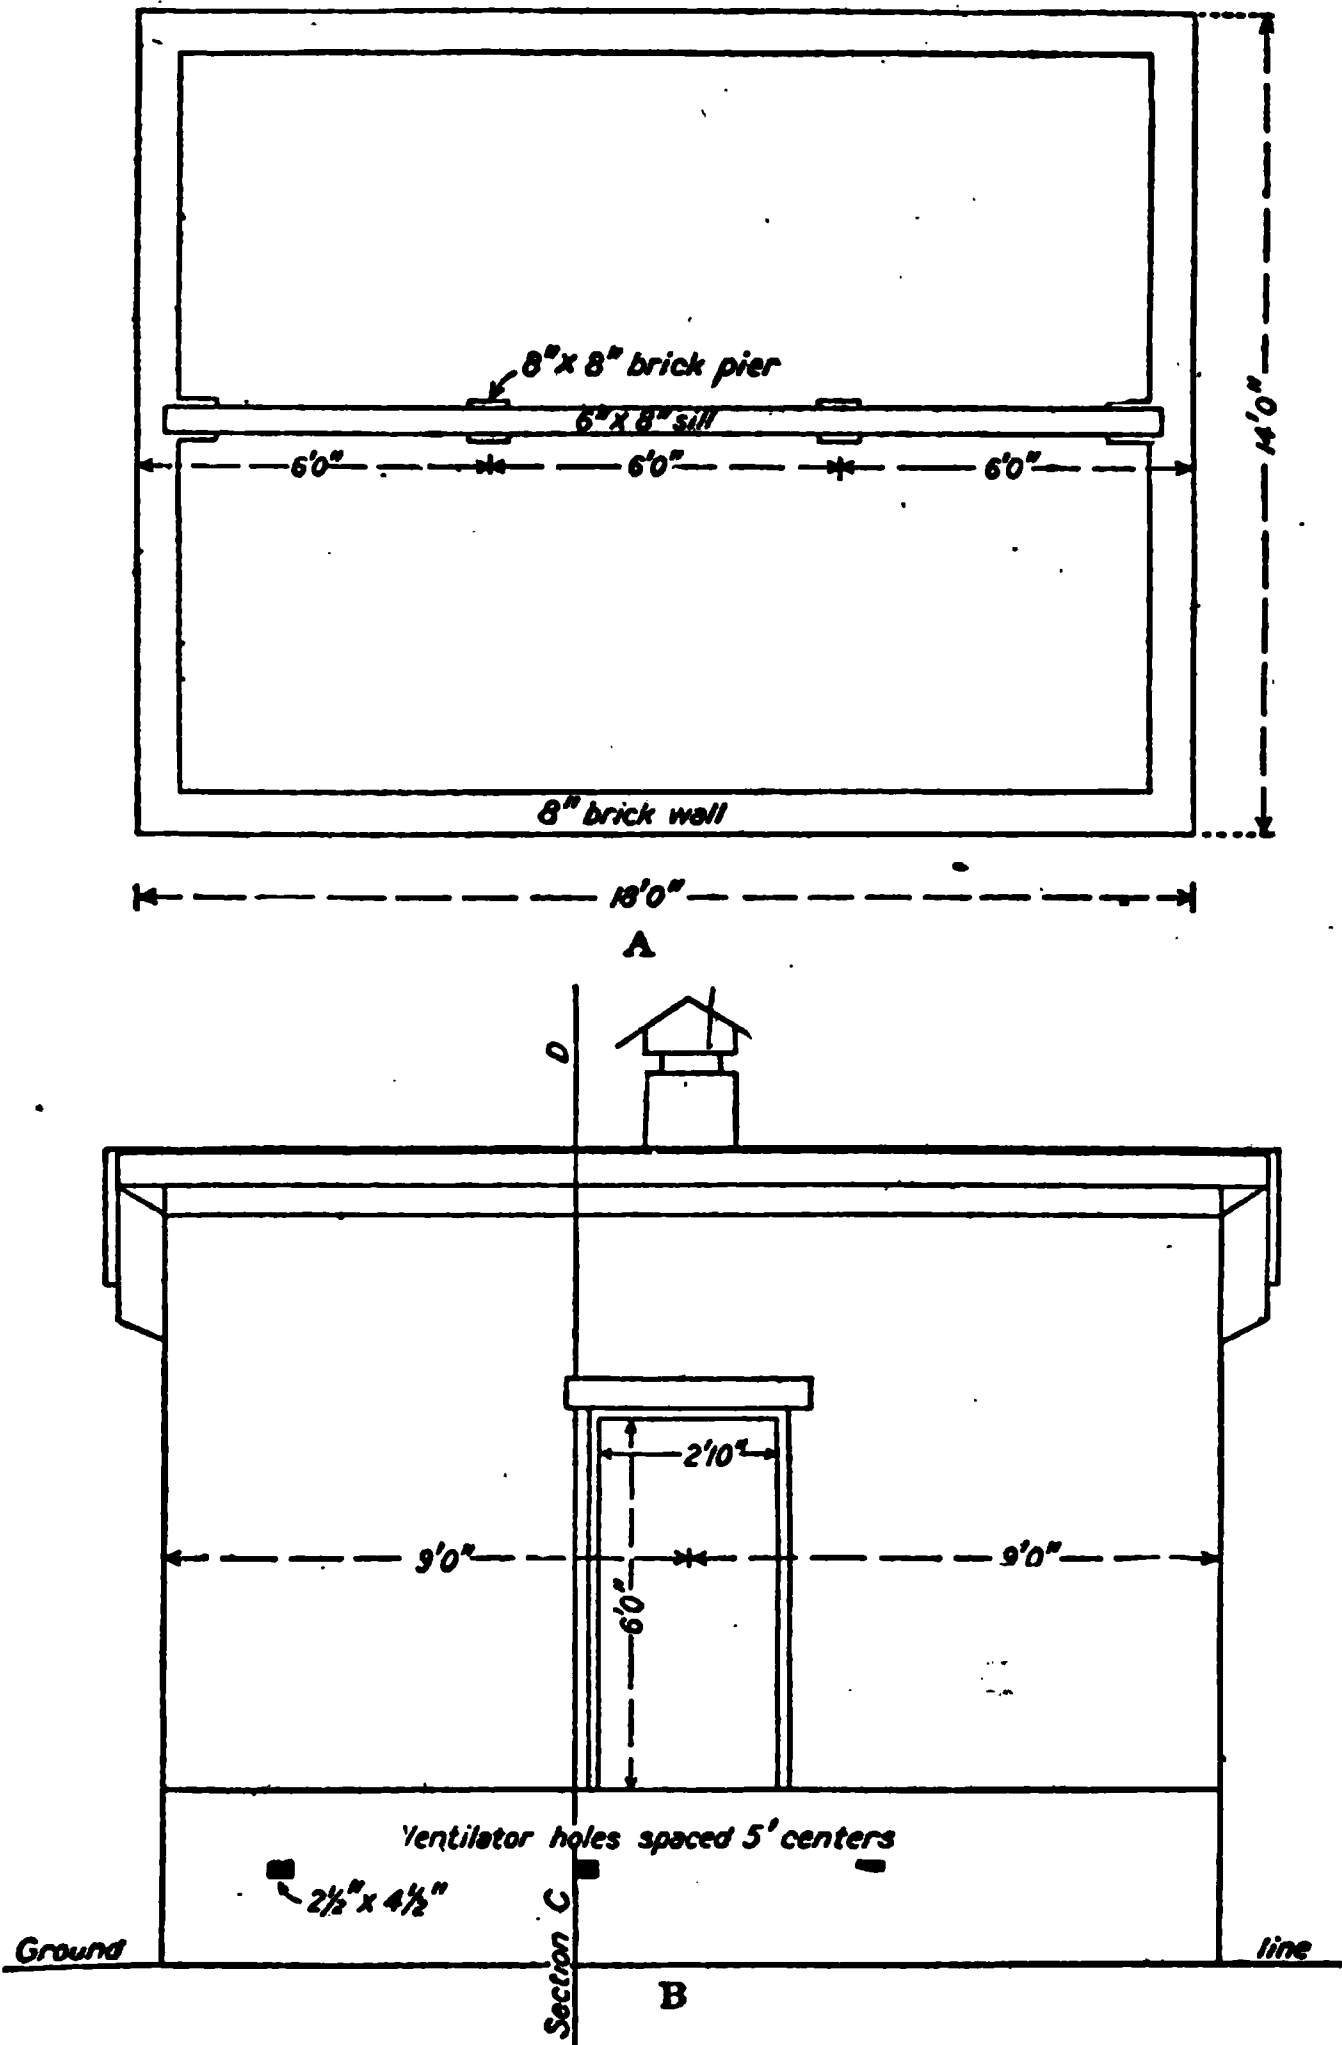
Front Elevation and Plan of Ventilation of Brick Magazine.
